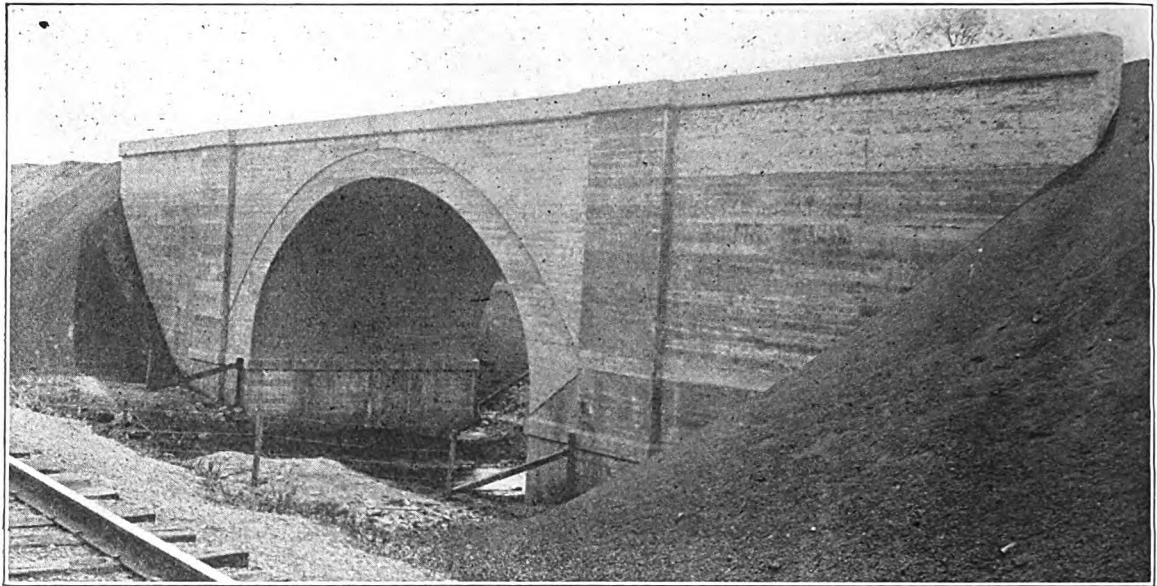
Reinforced Concrete 50-Foot Arch Near Maxwell, Ia., C., M. & St. P. Ry.
